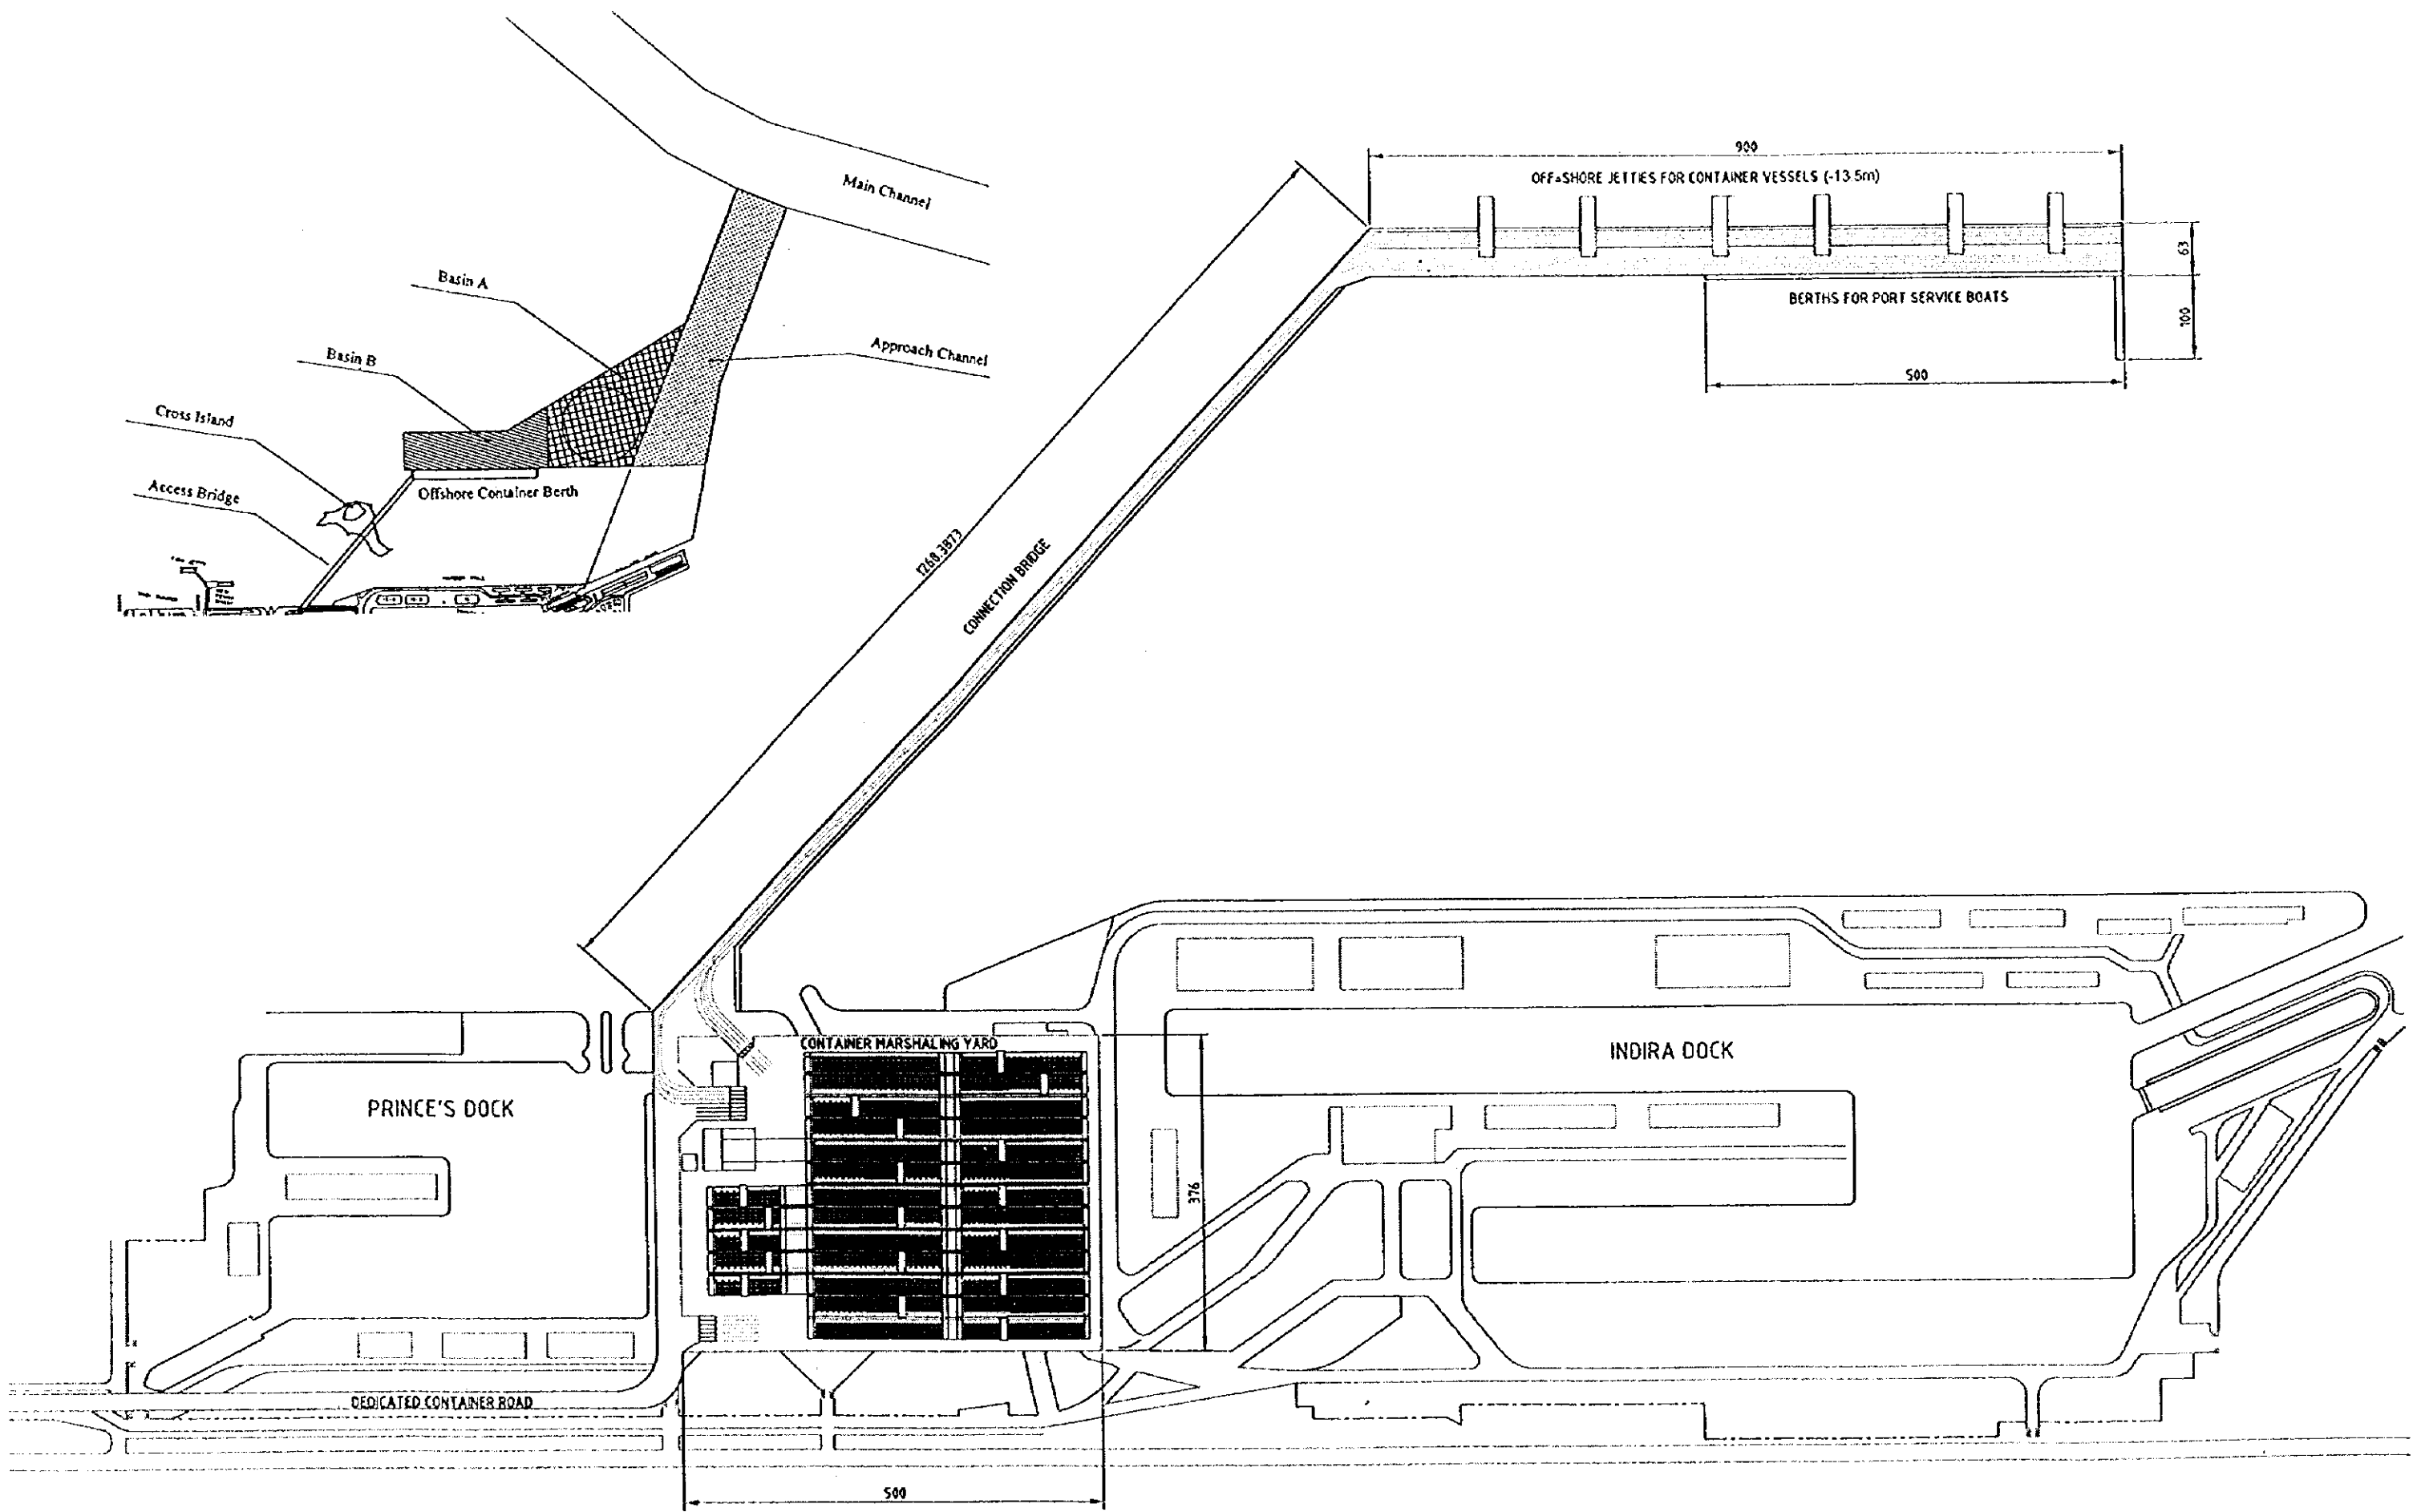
Layout Plan of A New Container Terminal at Victoria Dock (Alternative-6) SCALE:1:7,000
